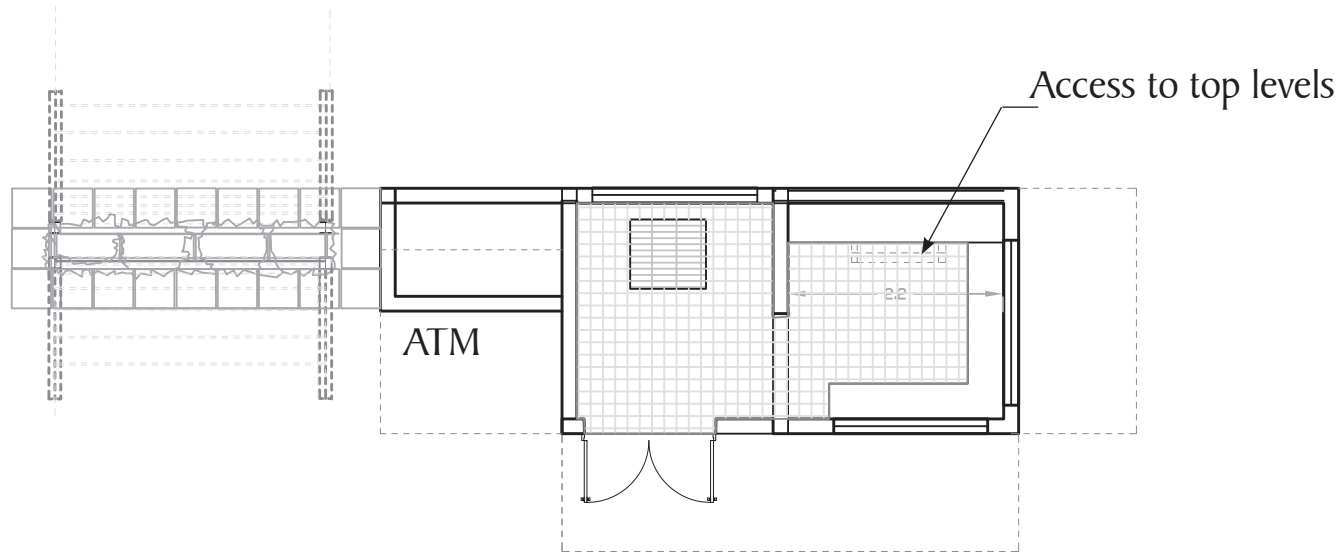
Diagrammatic plan view; information kiosk (Author, 2008) Scale: Not to scale
